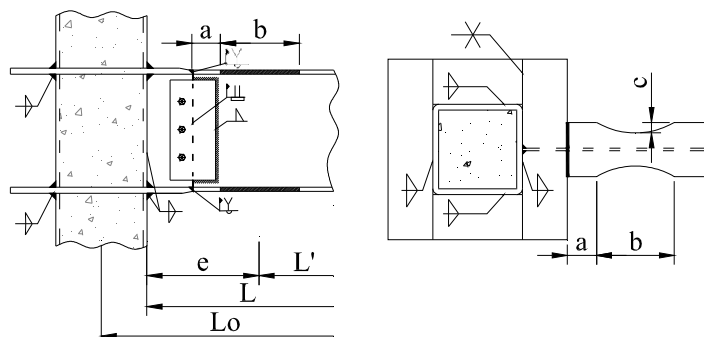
Welded beam to column joint with reduced beam section
